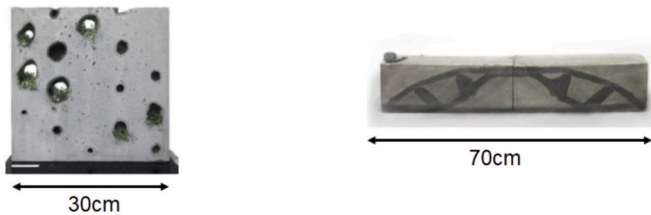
Injection 3D Concrete Printing variants: (a) Wall segment manufactured using the Suspension in Concrete technique; (b) Cross-section of an internally strengthened beam manufactured using the Concrete in Concrete technique with two different concrete types [30].
